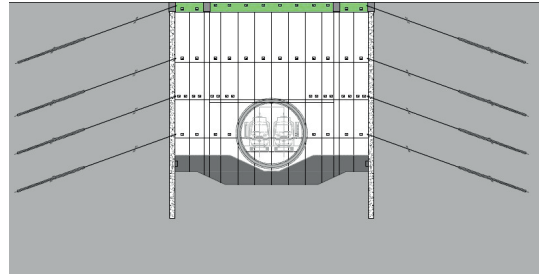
Schematic of Phase Four – Construction of the Bottom Slab
